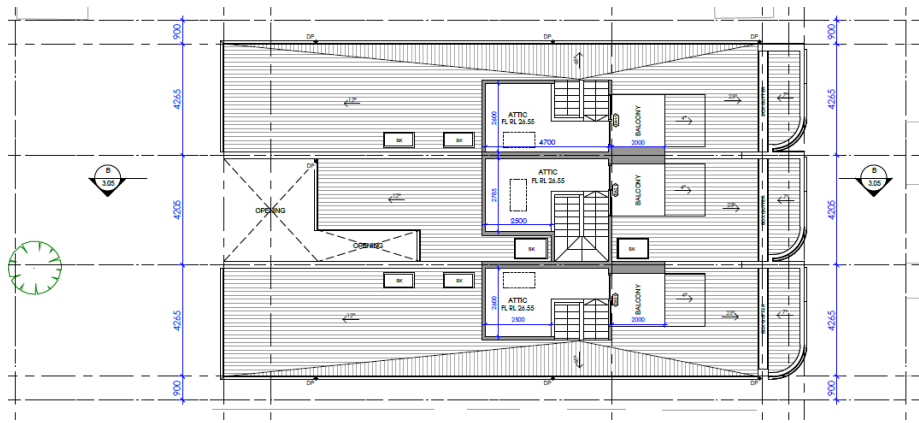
Initially proposed attic floor plan (Source: Bryan Long Group)
